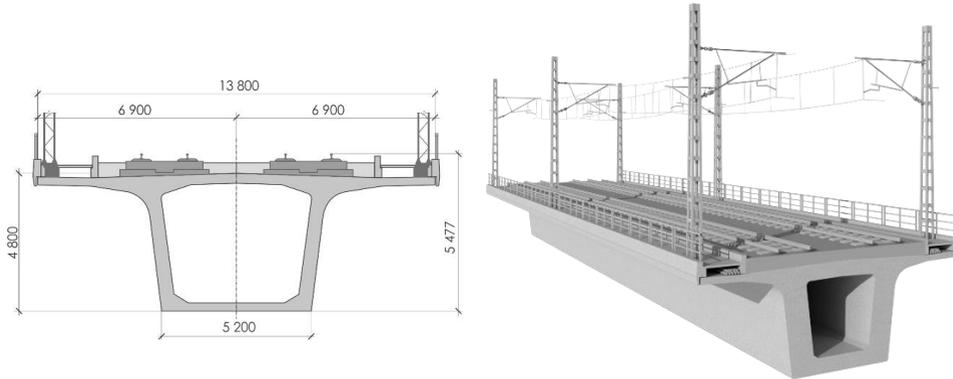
Unified double-track split beam span structure of box section from prestressed concrete with full length of 50.0 m for high-speed railway "Moscow-Kazan".
